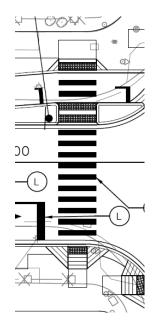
Example of Curb Ramp Dimension at the Intersection of Fenton Street and Sligo Avenue
